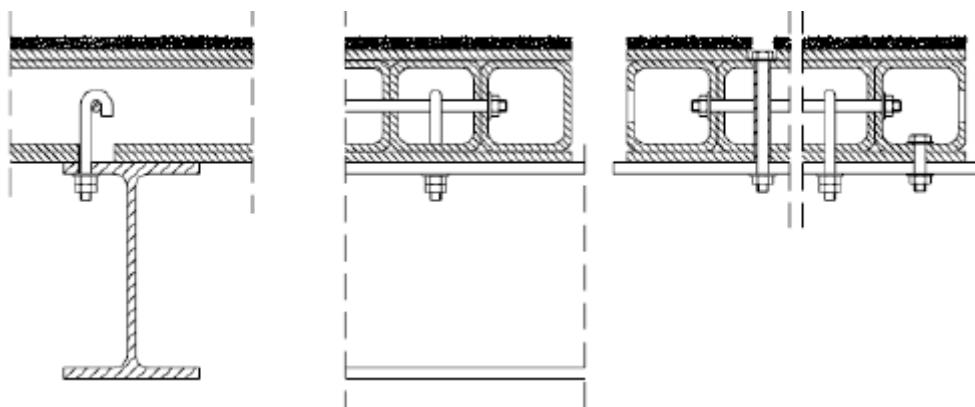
Mechanical connections between FRP composite decks and steel girders designed by Strongwell Virginia Tech (Potyrala 2011)
